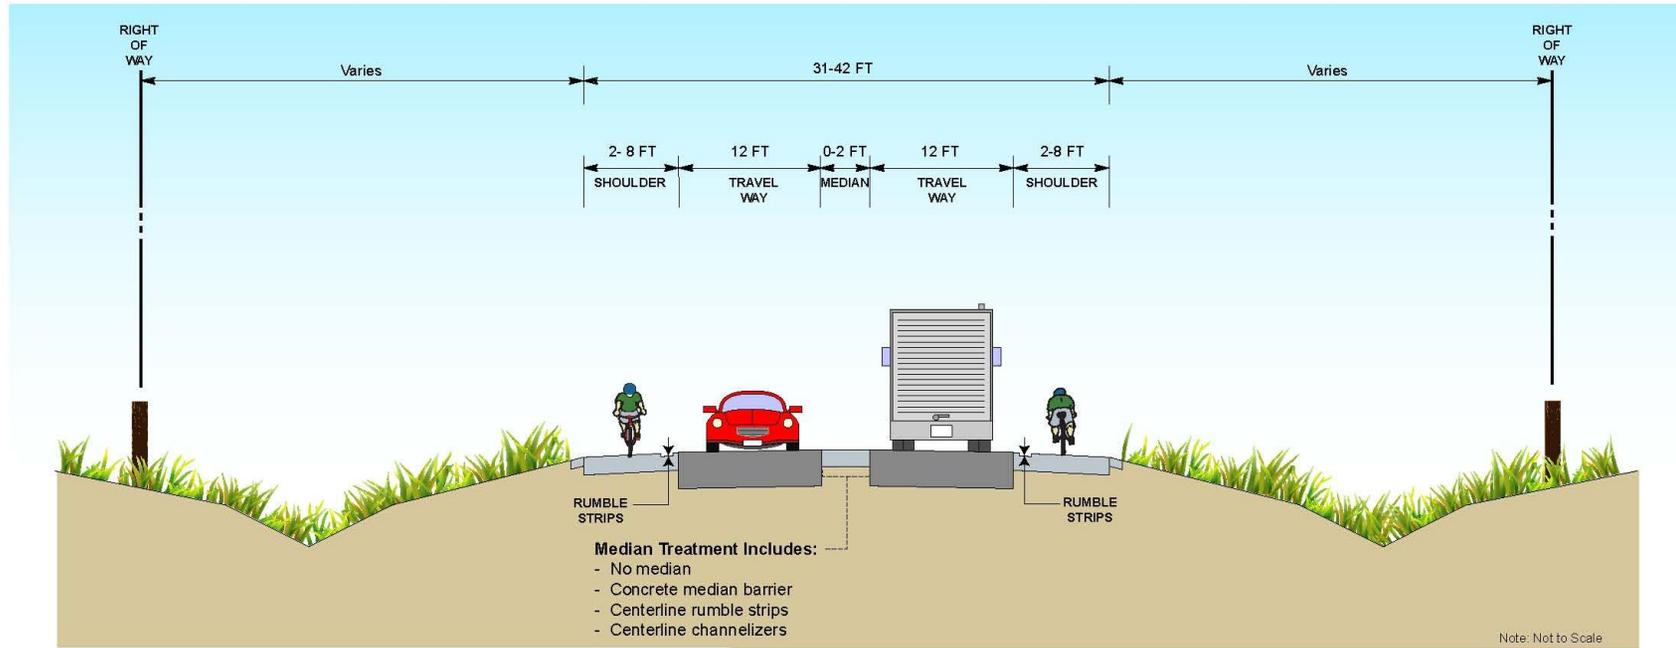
Typical Cross Section - Barrier Separated Two-Lane Strategy
